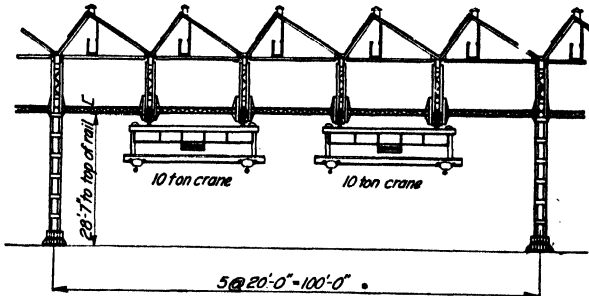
Structural steel fabricating shop. Longitudinal section through punching and assembling departments.
